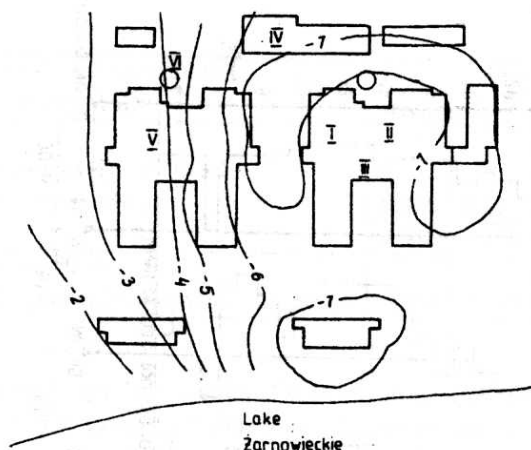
Dewatering level around site building and locations of subsoil load tests (from I to VI)
